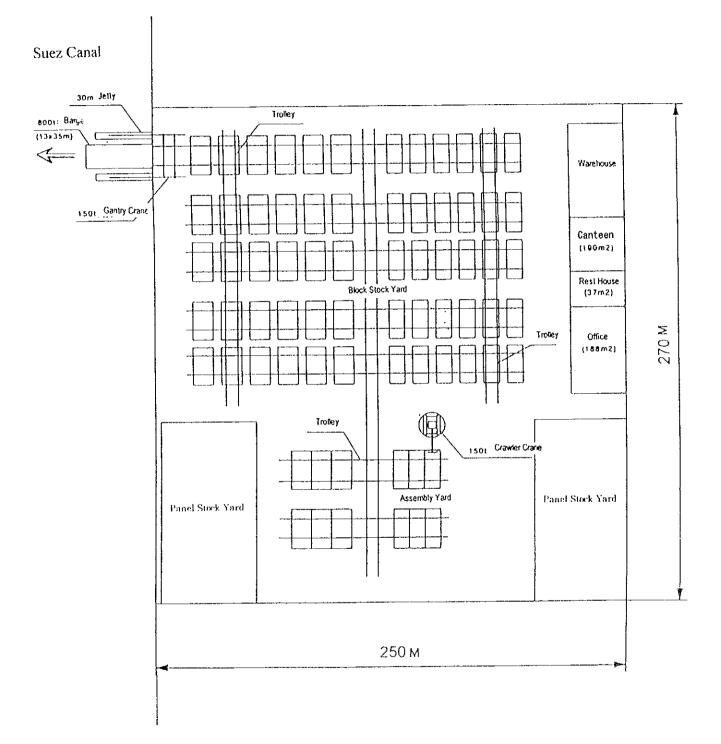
Steel Girder Assembly Yard (East Bank)
